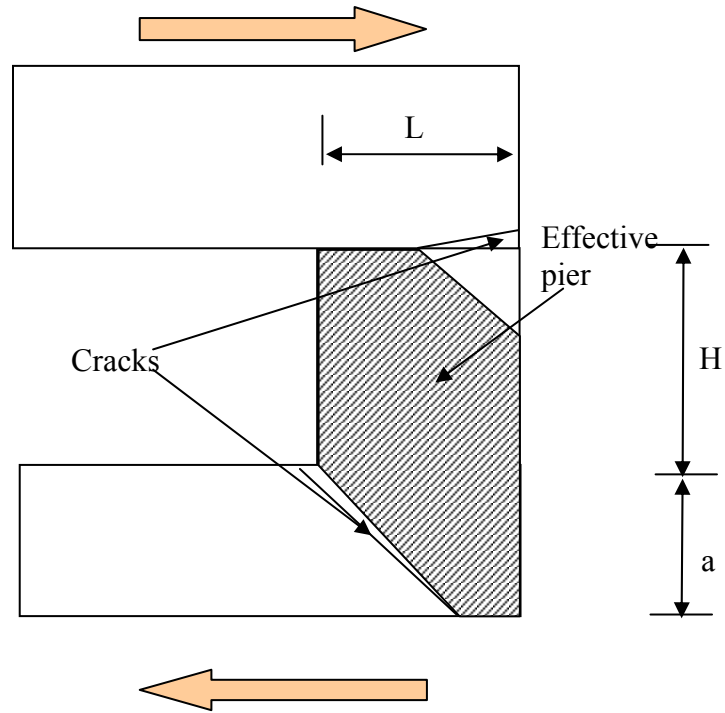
Effective pier of an exterior door pier when loaded from left to right
